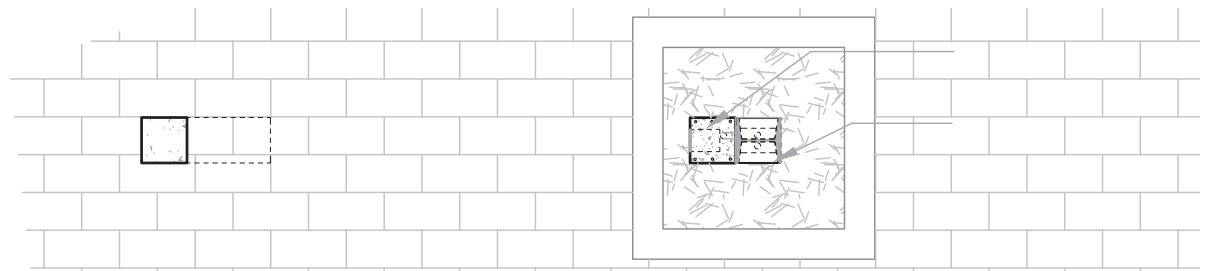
Bollard without light Plan. Scale 1:25 (Author, 2008)
